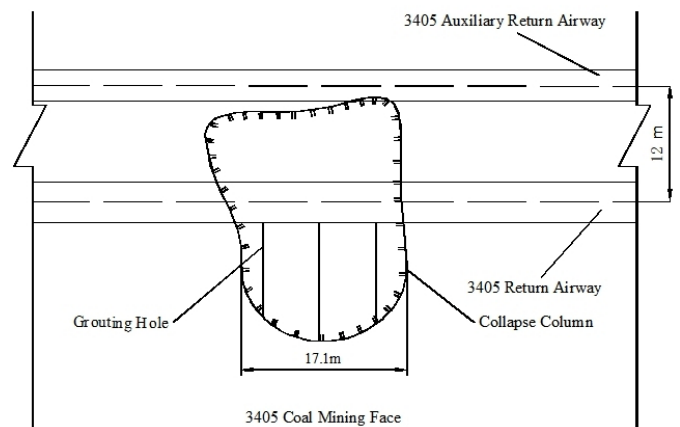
Diagram of collapse column location and grouting hole layout ahead of the 3405 coal mining face.
